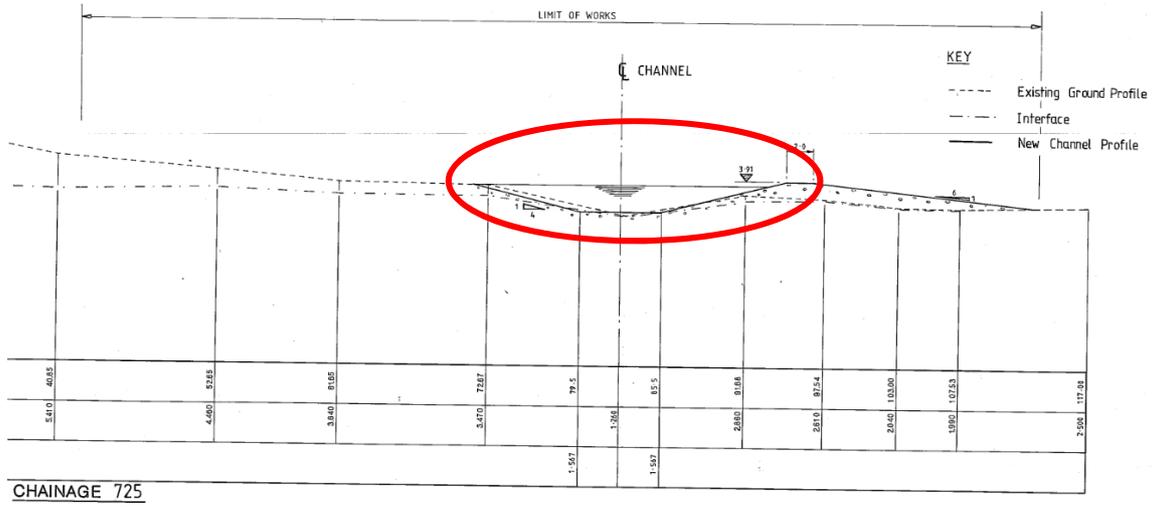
Typical cross-section of the channel between ‘The Windows’ and the ‘Portland Harbour Culvert’ (refer to Appendix I.2 for further details).
